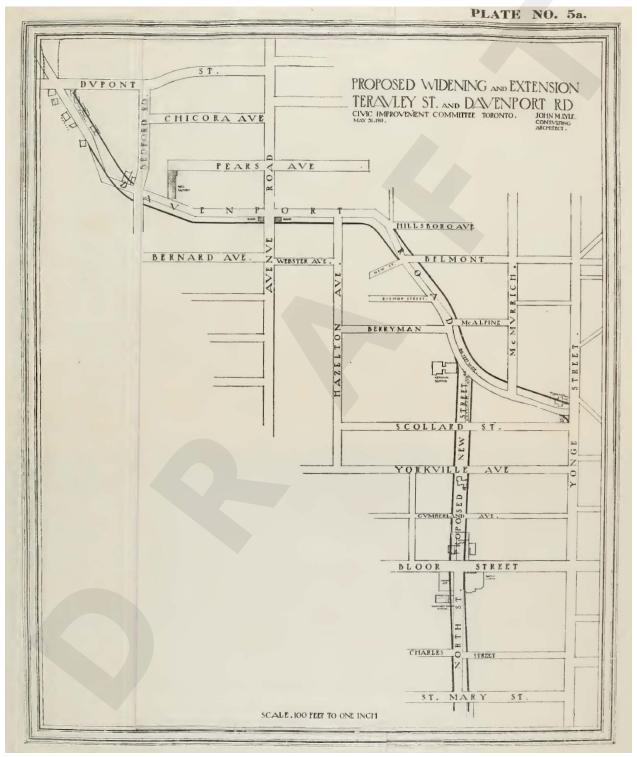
1911 plan showing the proposed route of the Teraulay Street extension north of Bloor to Davenport Road. The plan also outlines the intended widening of Davenport Road (1911 Civic Transportation Committee Report).
